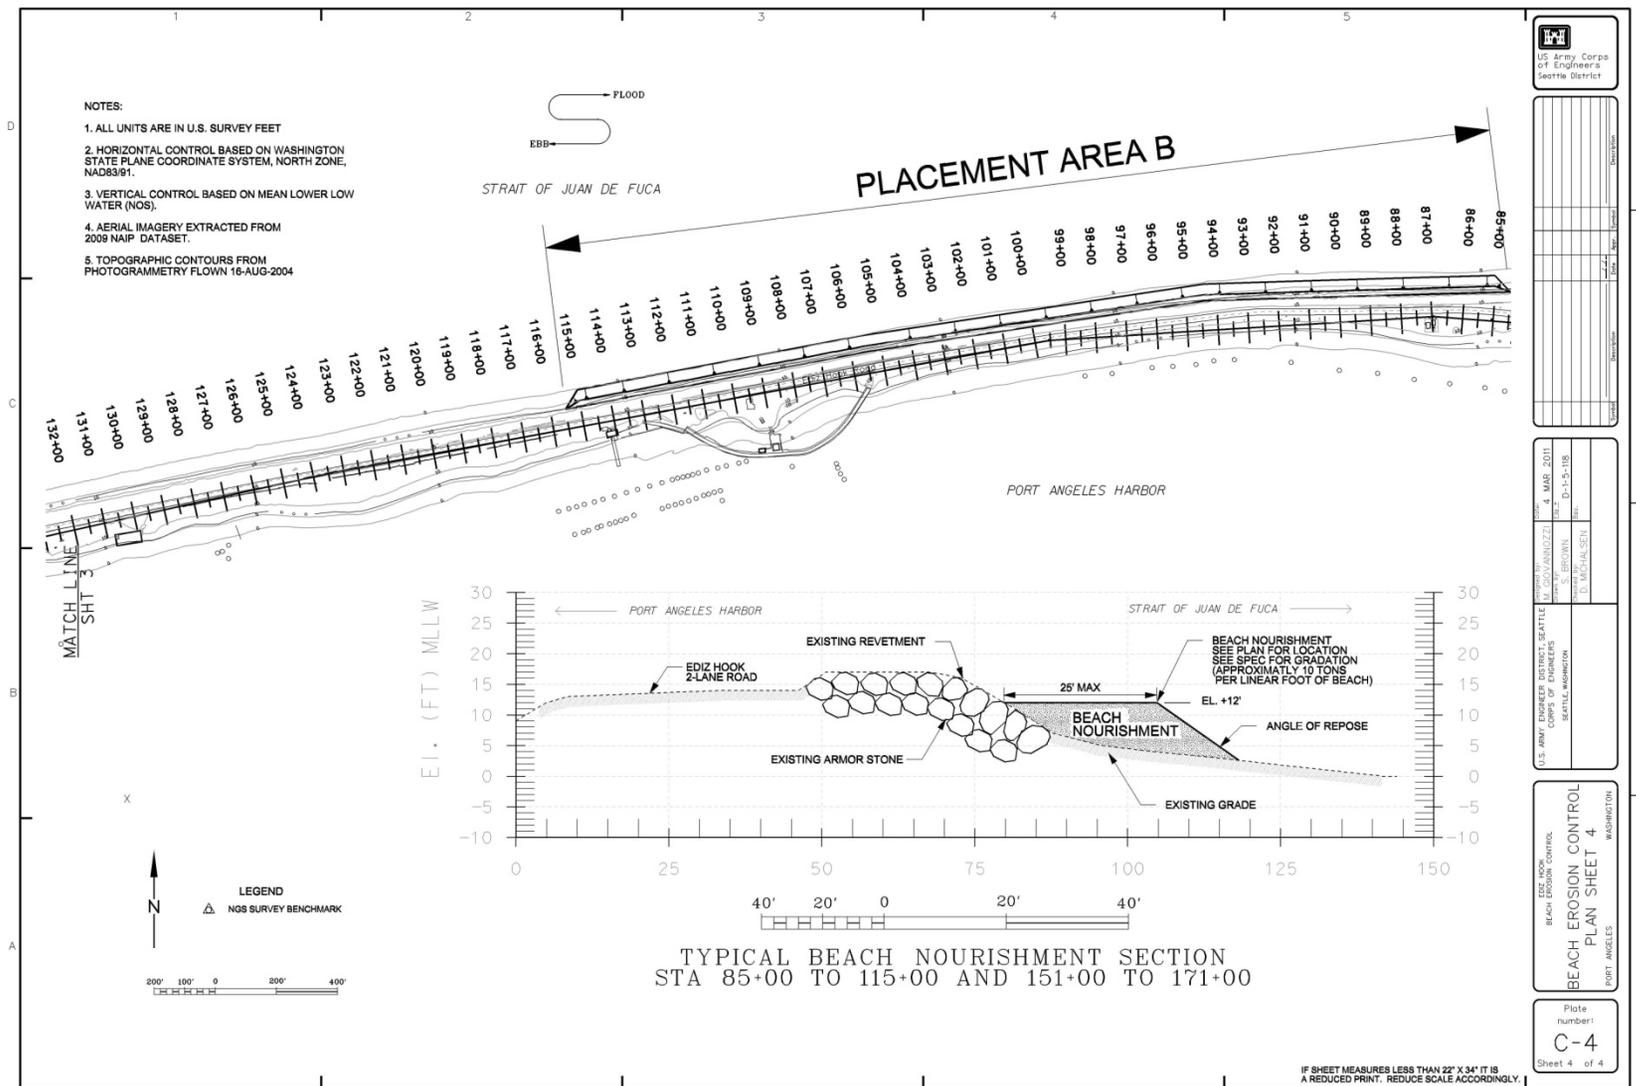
Ediz Hook beach nourishment, Area B; and typical cross section.
